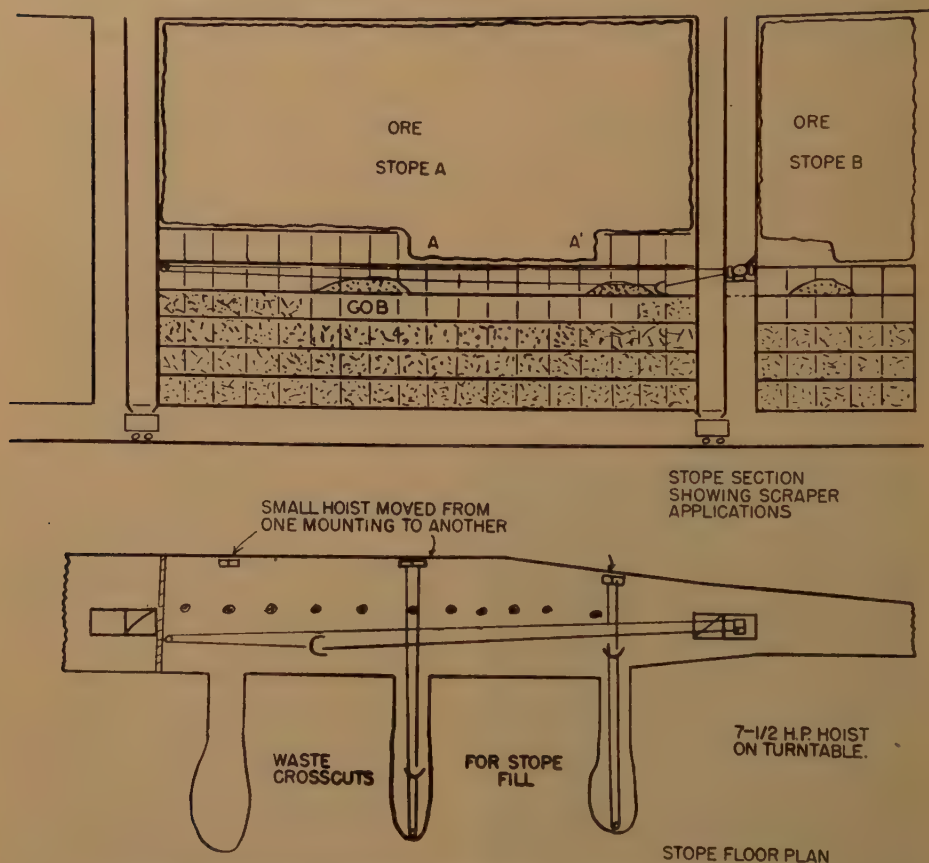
EXAMPLE OF TIMBERED CUT-AND-FILL STOPING WITH SCRAPER HOIST.
